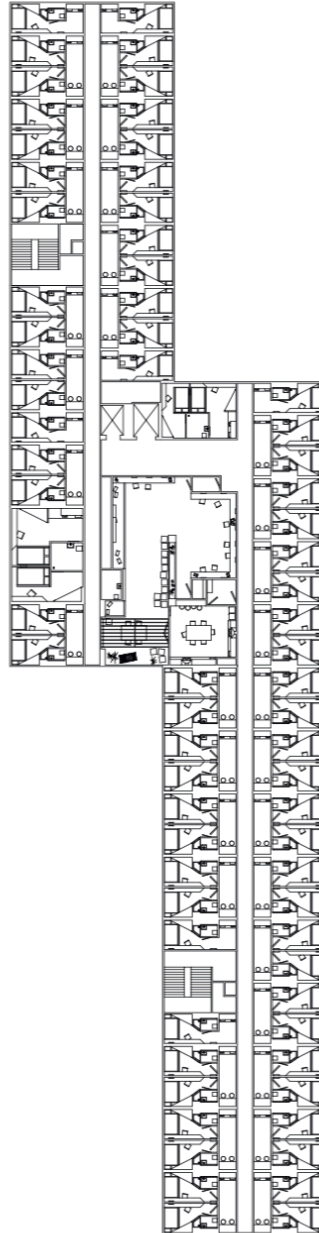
Typical floorplan of The Collective Old Oak, London. Source: The Collective LLP
